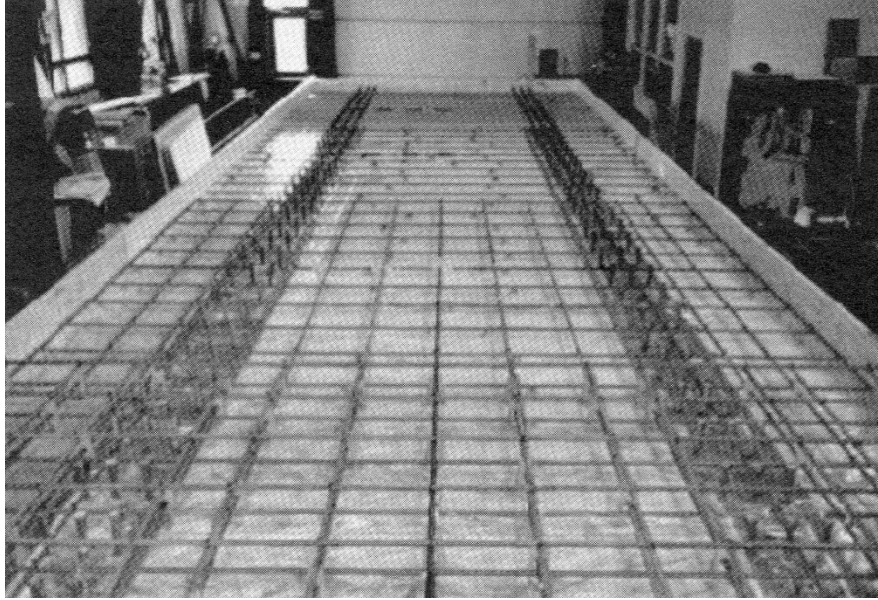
Photograph showing reinforcement in all four sections of the full-scale model of the deck slab (Khanna et al., 2000).
